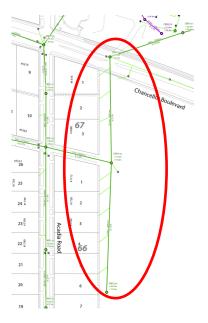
Existing 300mm Storm Sewer behind Acadia Road
